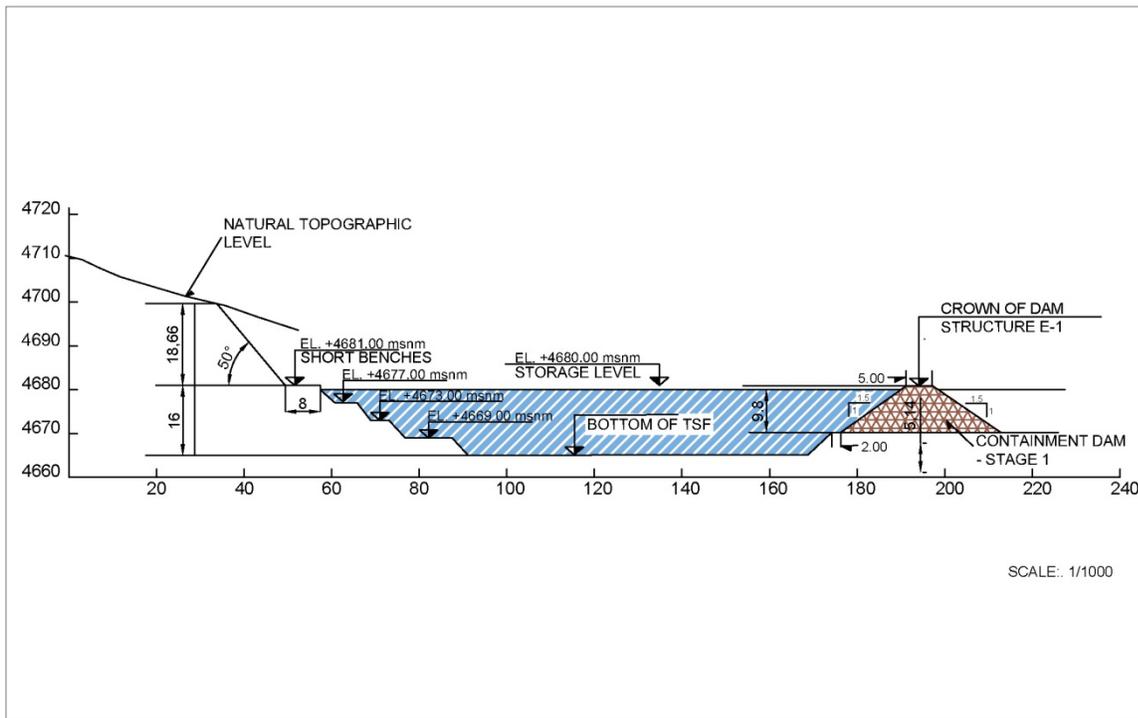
First Stage Design of the tailings dam (source: DICAT, 2021).
